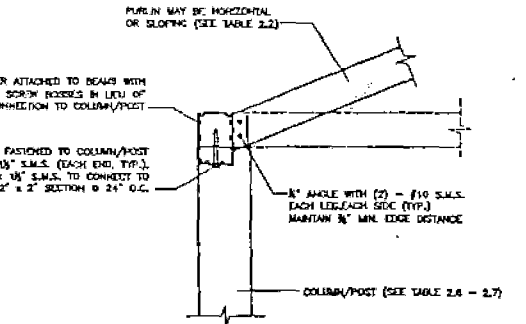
TYP. CARRIER BEAM TO BEAM CONNECTION
